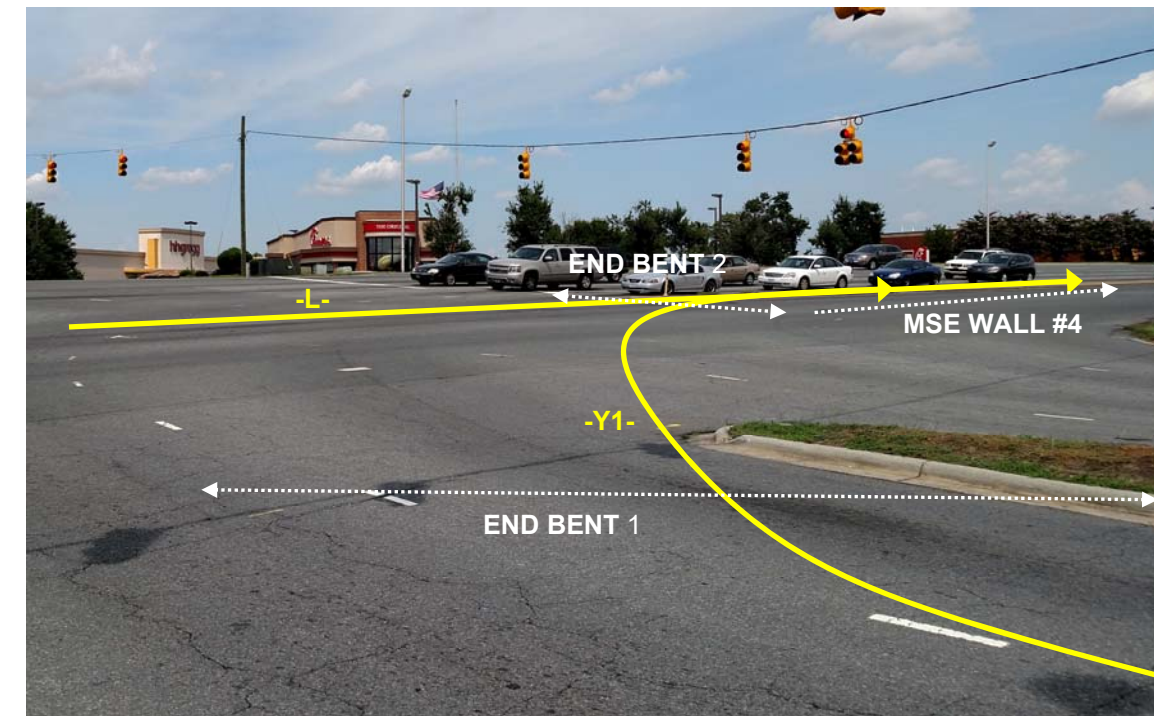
Looking west at -L- (Concord Mills Blvd.) and walls on -Y1-
